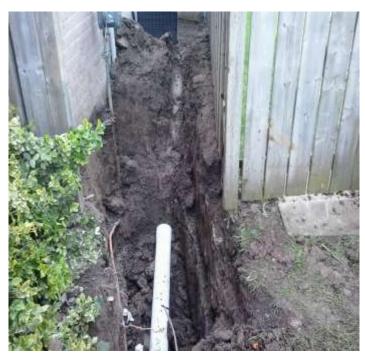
receiving pit to retrive storm PDC to connect to sump pump discharge pipe
